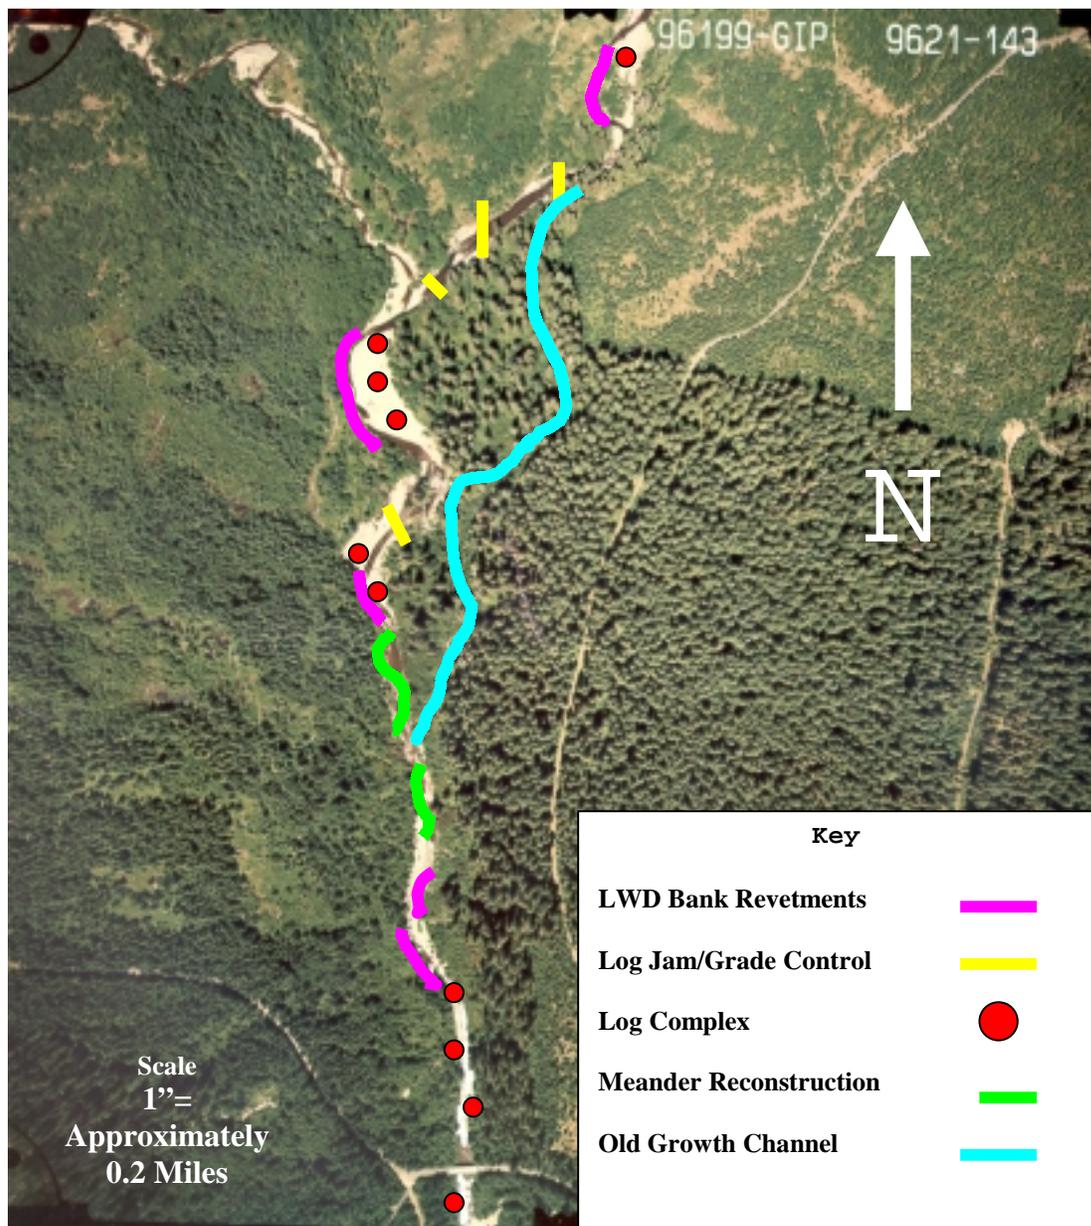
1999 Trout Creek Restoration Project Plan, T.4N., R.6E. Section 13, Skamania County Washington. (Photo Bair)
